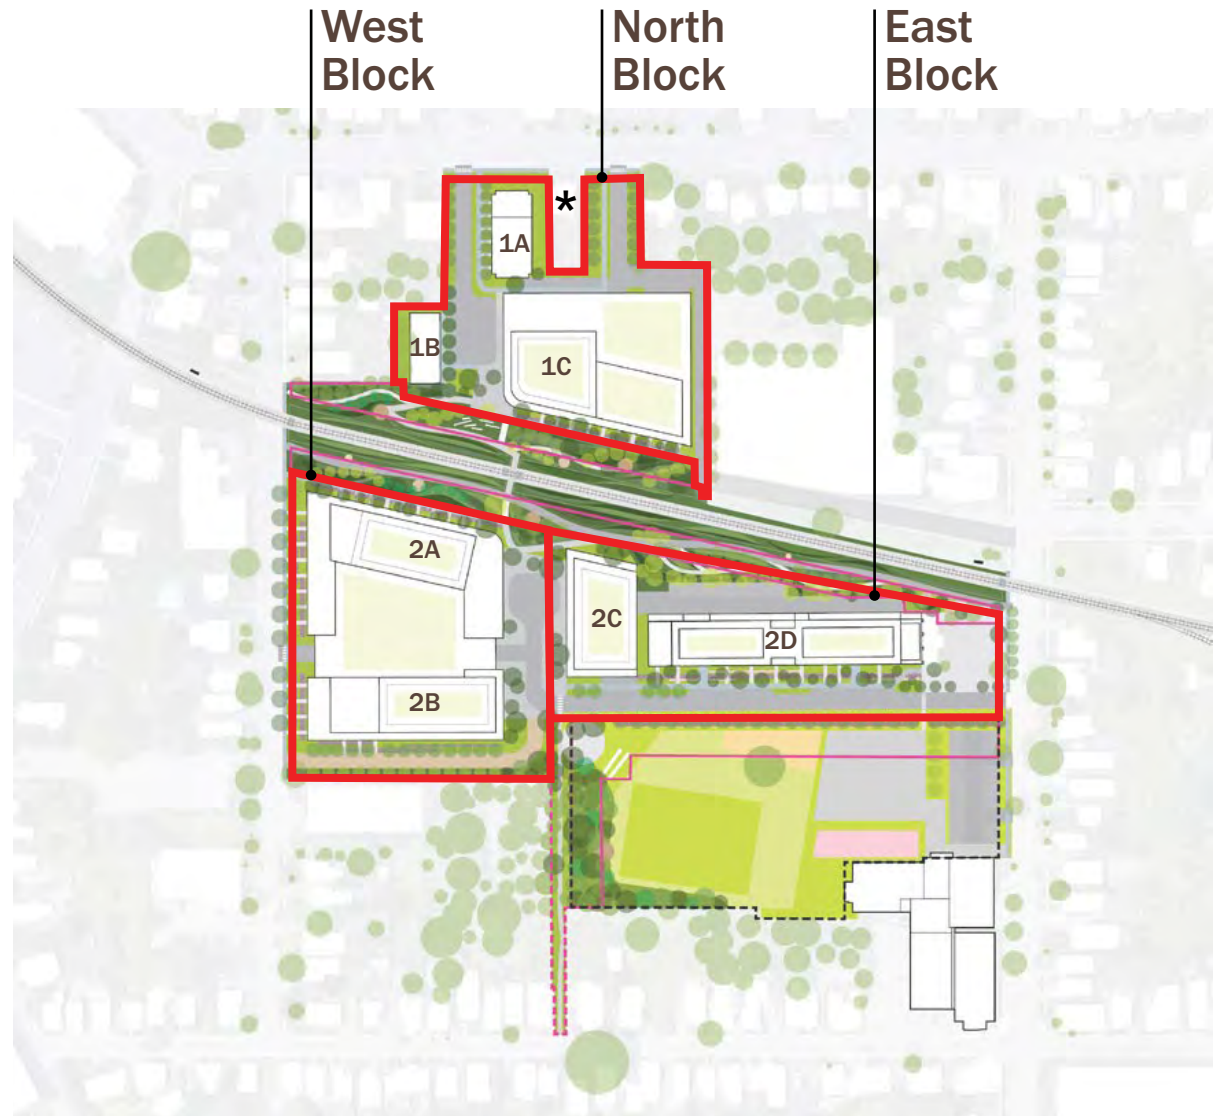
The redevelopment concept for Plant No. 2 breaks the site into three blocks
